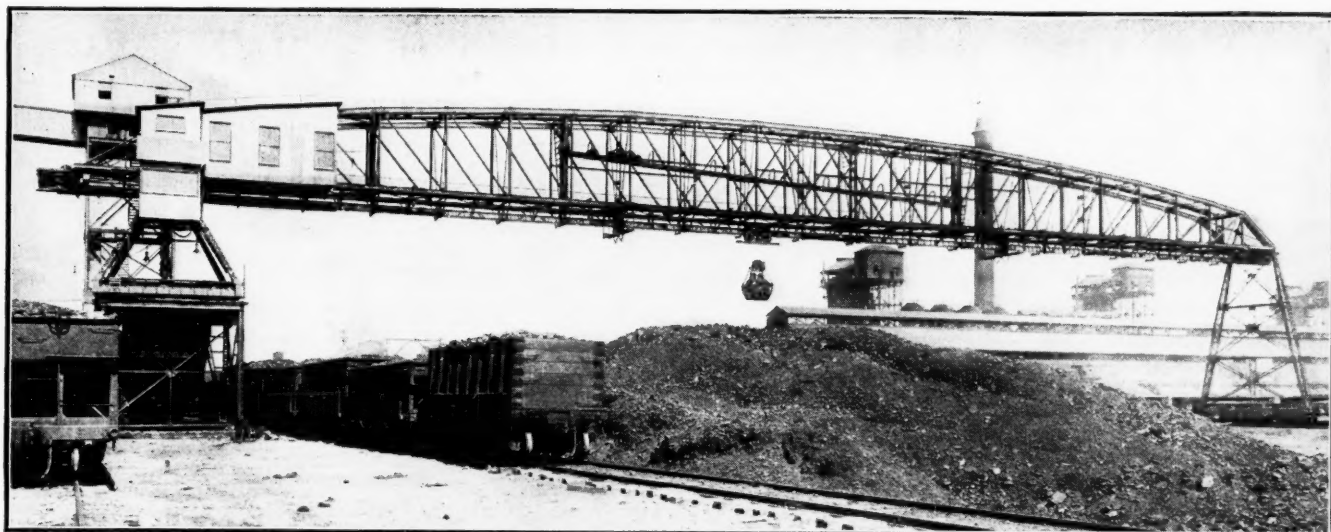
GENERAL VIEW OF SWINGING BRIDGE STORAGE PLANT
